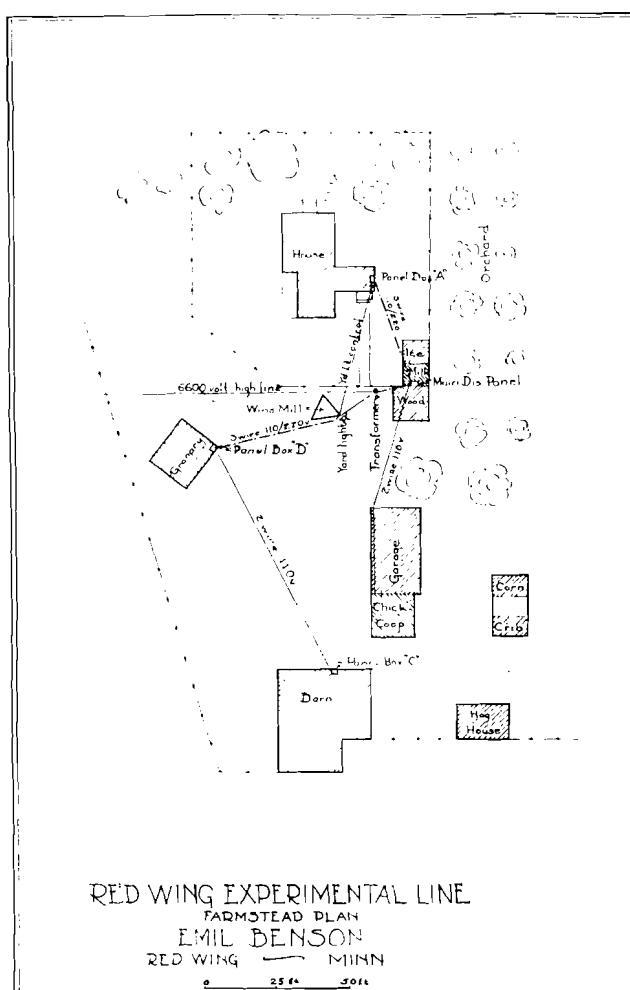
Farmstead wiring plan based on a study of wiring shown in Figures 5 to 10, with transformer in the center of the load.
